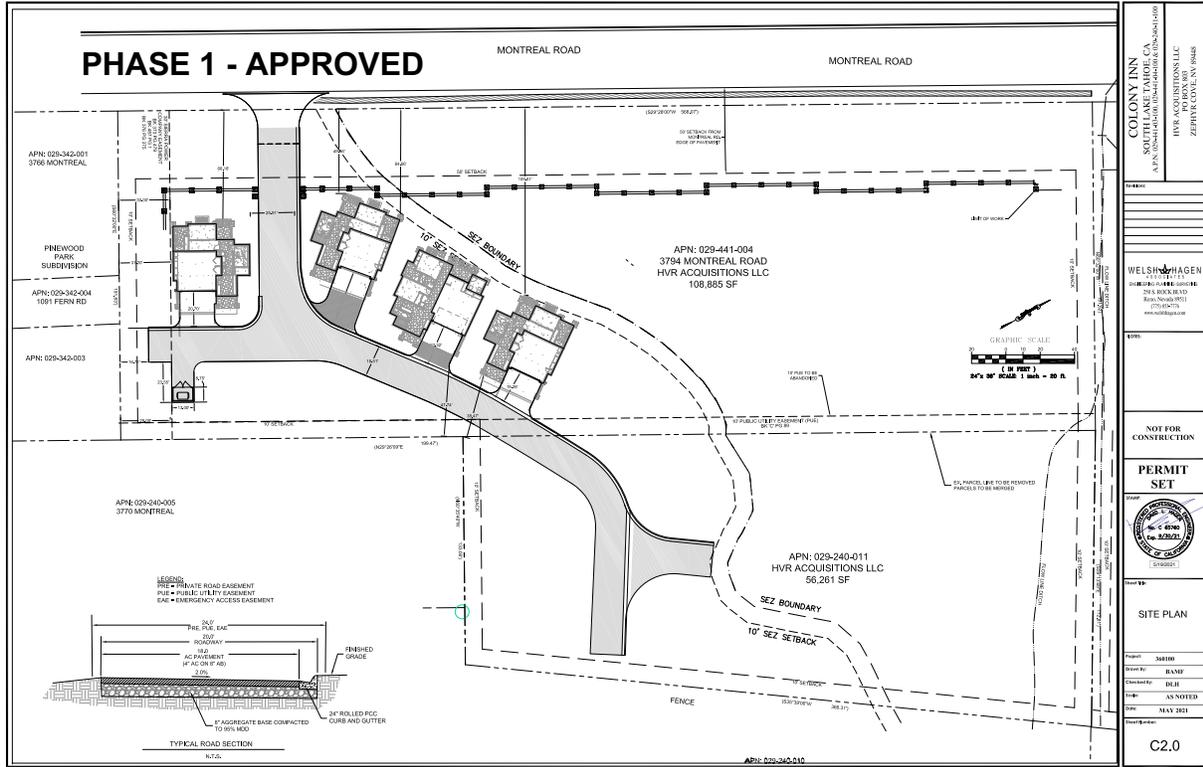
Site Development Plans - Multi-Family Residential Project
